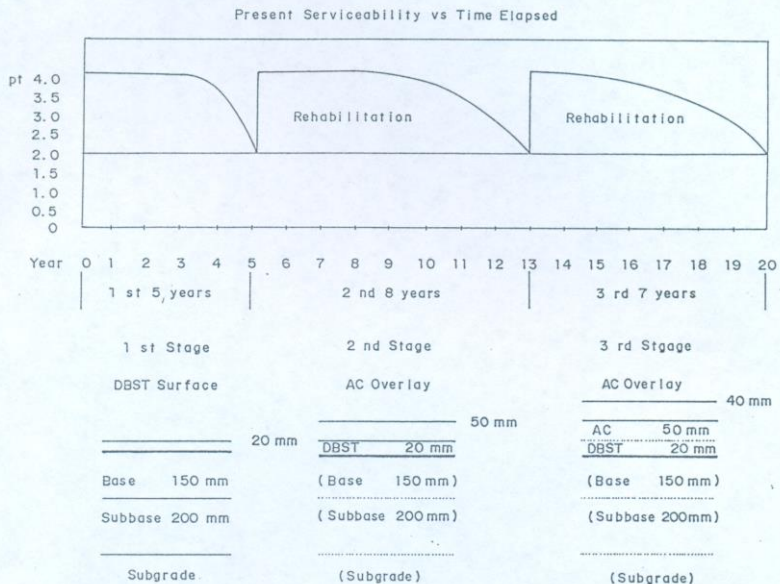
AN EXAMPLE OF PAVEMENT STAGE CONSTRUCTION METHOD
